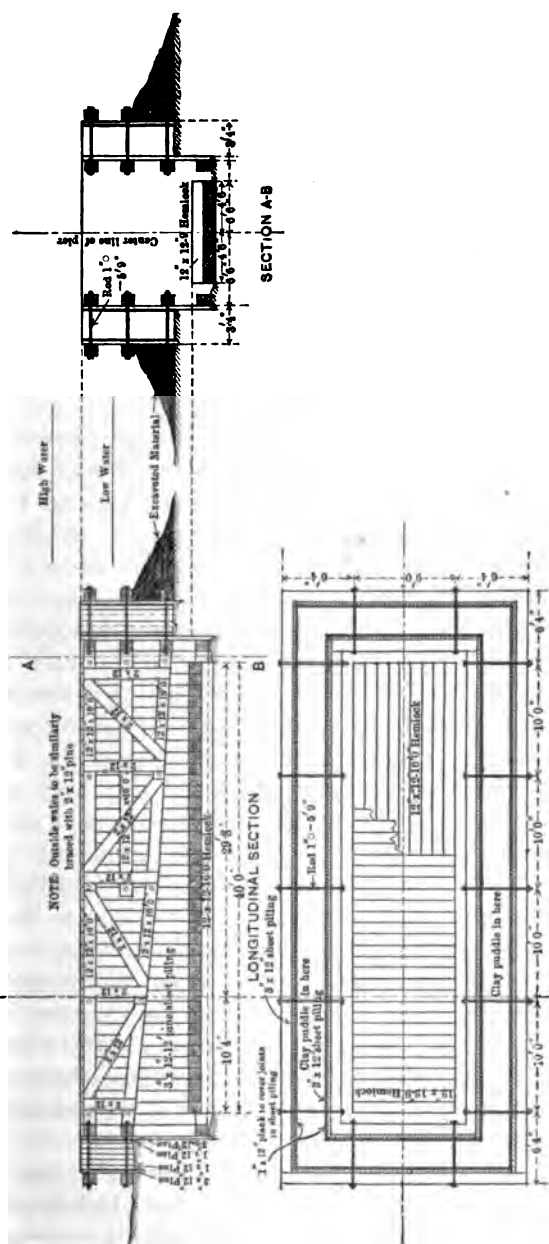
COFFER-DAM FOR ANN ARBOR BRIDGE. MICHIGAN CENTRAL RAILWAY.
